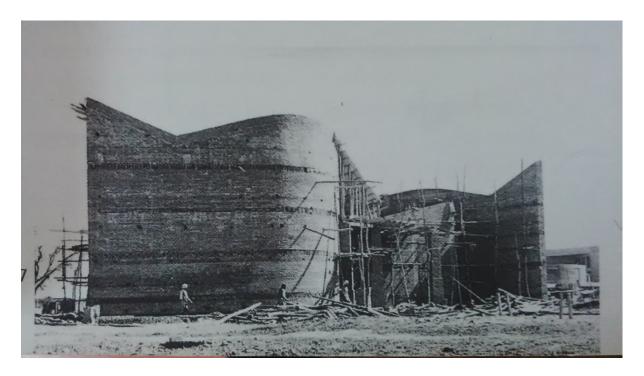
Construction of Gandhi Bhawan in progress. Bamboo scaffold, ring beams and masonry walls are visible. (Source: Joshi 1999)
